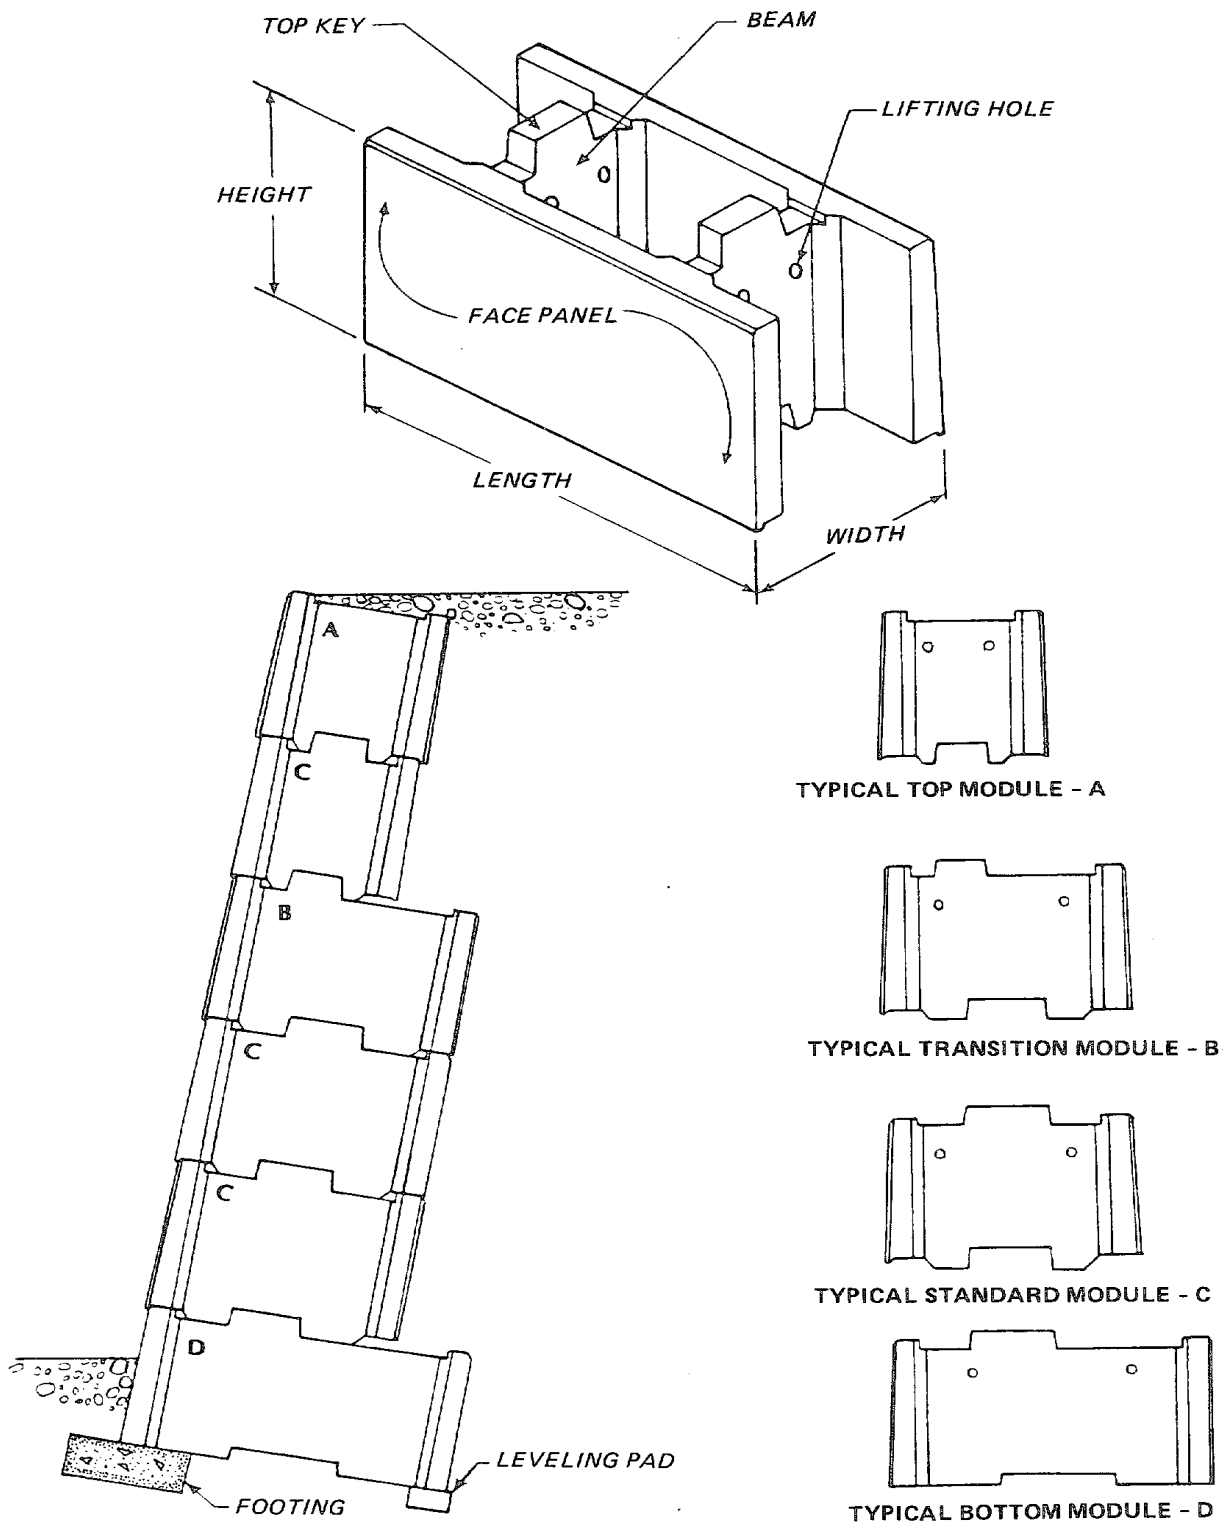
Schematic diagram of Doublewal retaining wall
